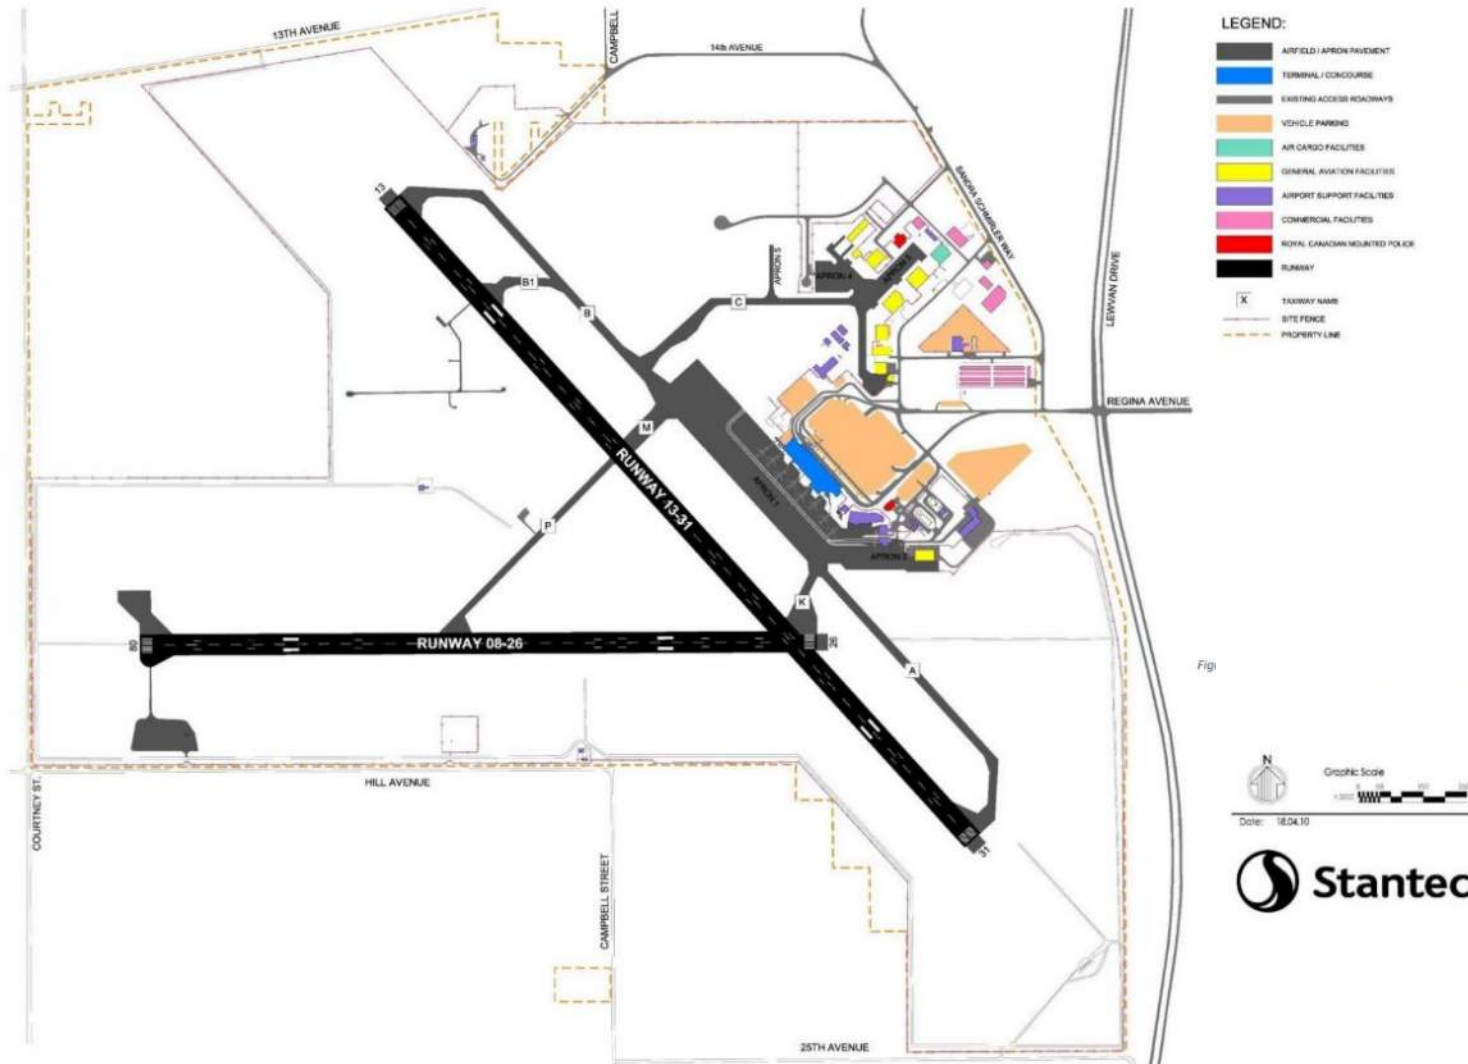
Regina International Airport Master Plan 2037, Existing Facilities
